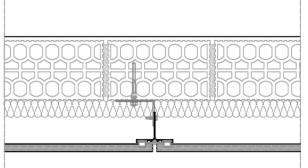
Horizontal section. Faveton® SAH Acqua 20-H.
